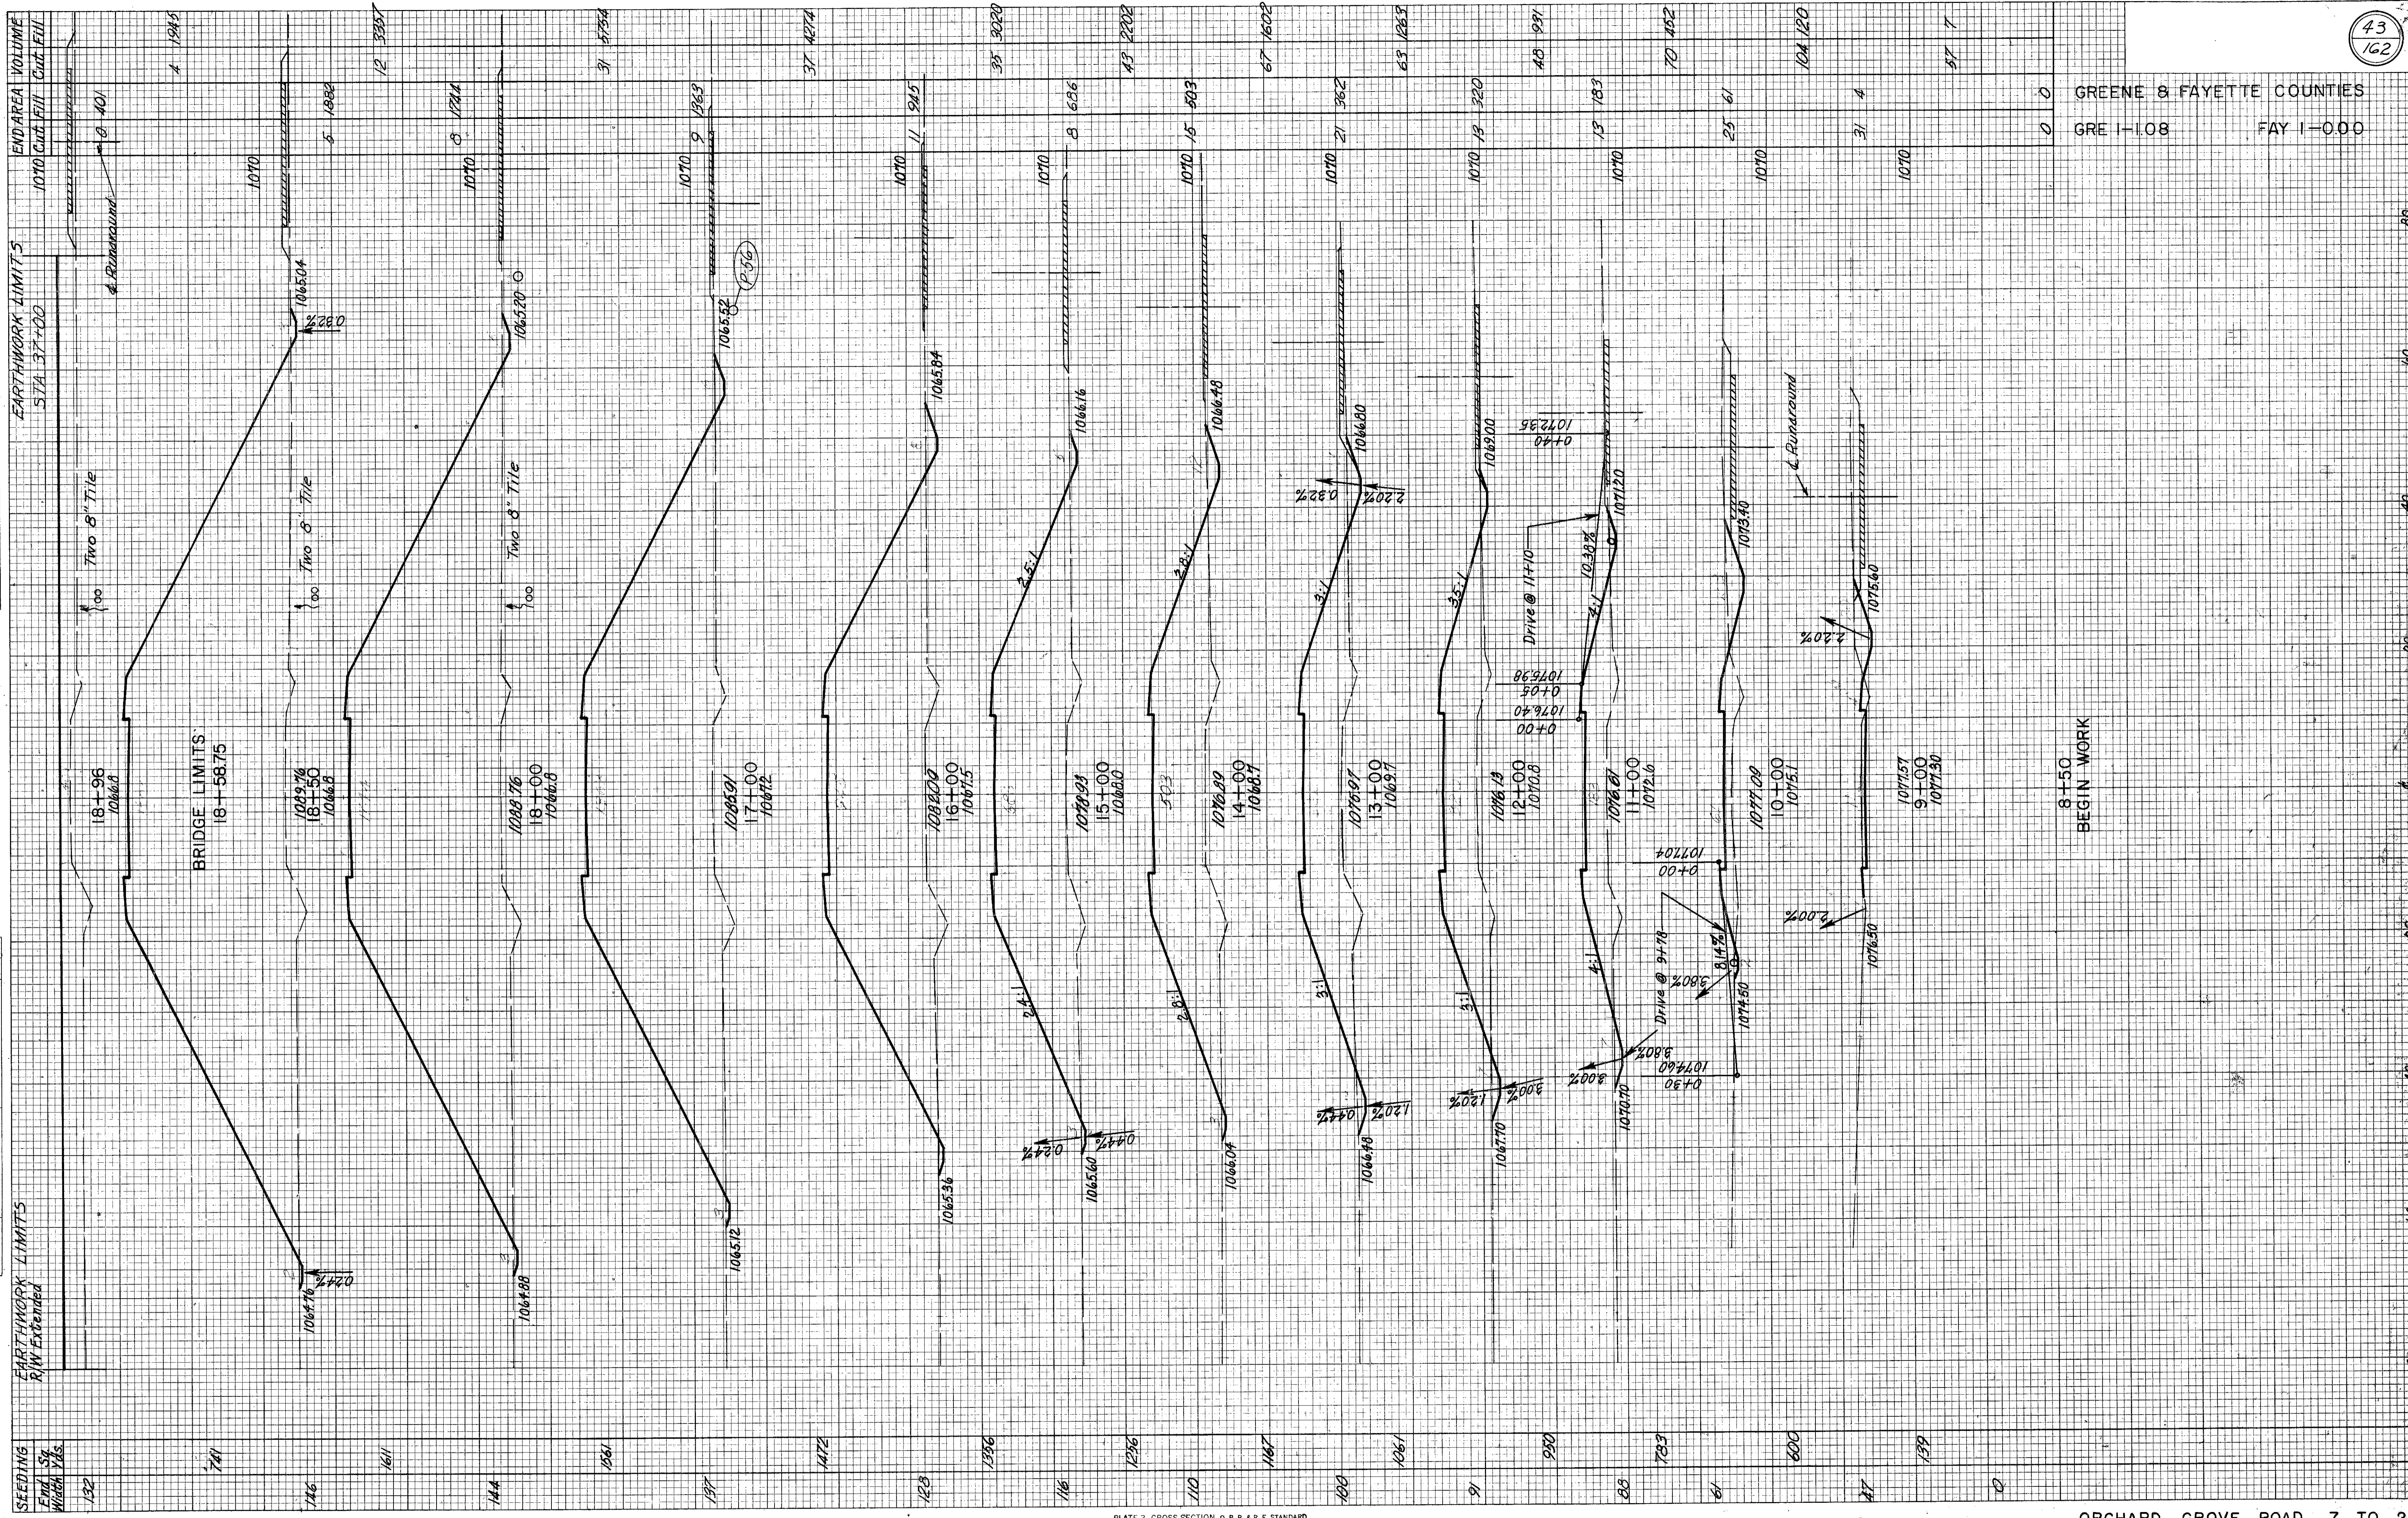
CROSS SECTION O. P. R. & R. E. STANDARD
